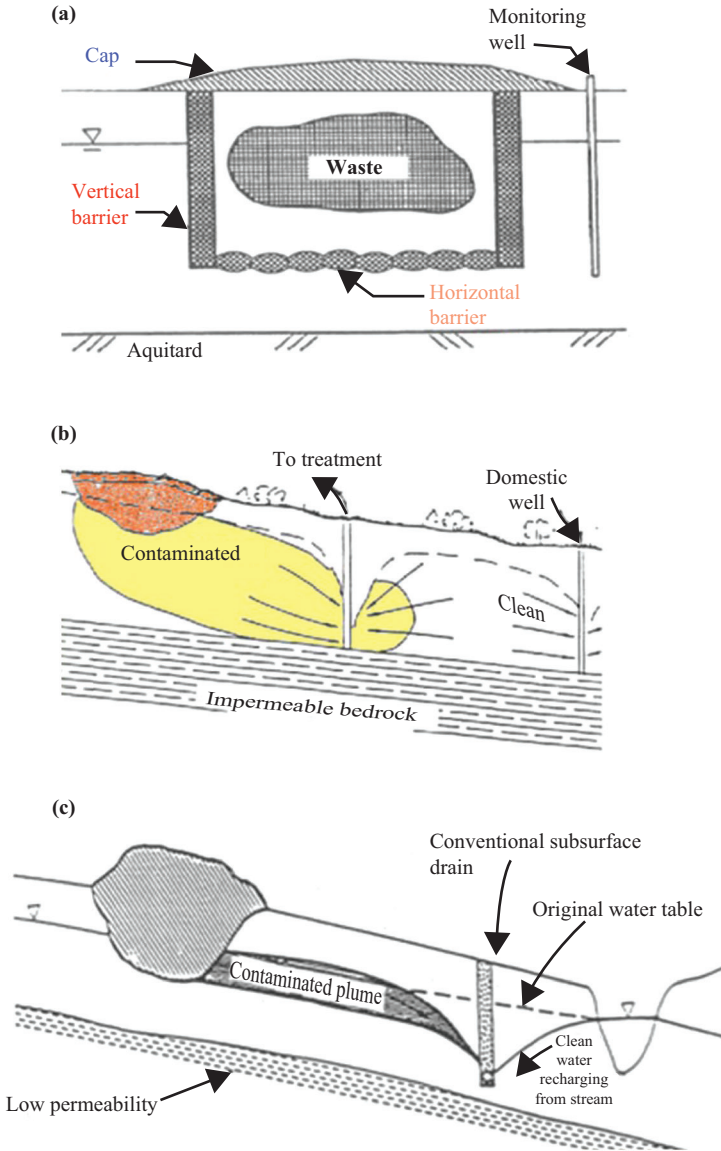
Containment technologies: (a) cap, vertical barrier, and bottom barrier; (b) pumping well systems; and (c) subsurface drain system.
